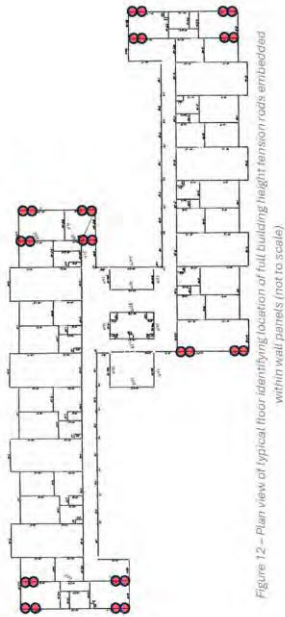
Plan view of typical floor identifying location of full building height tension rods embedded within wall panels (not to scale)
